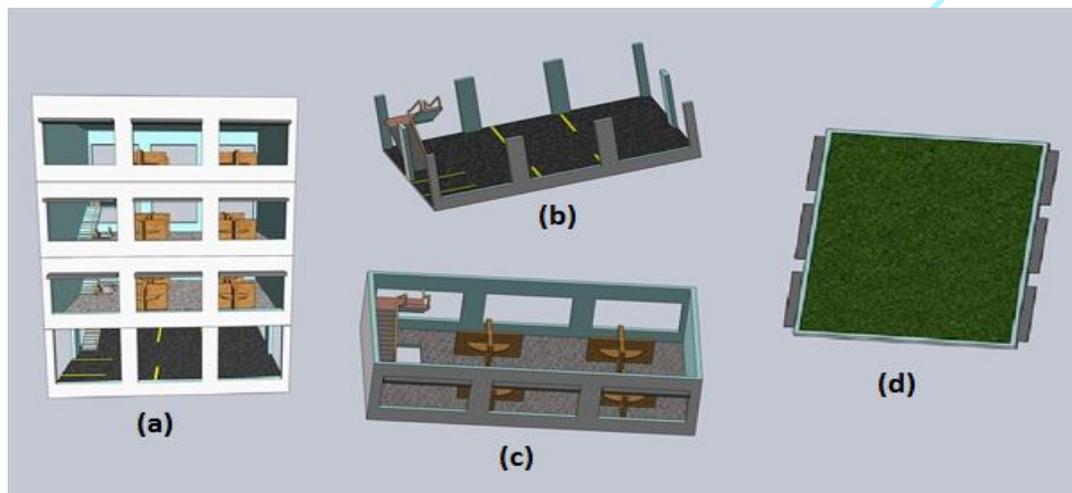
Building Design. a) 4-Storey Building, (b) Parking Lot, (c) First Floor (d) Green Roof
